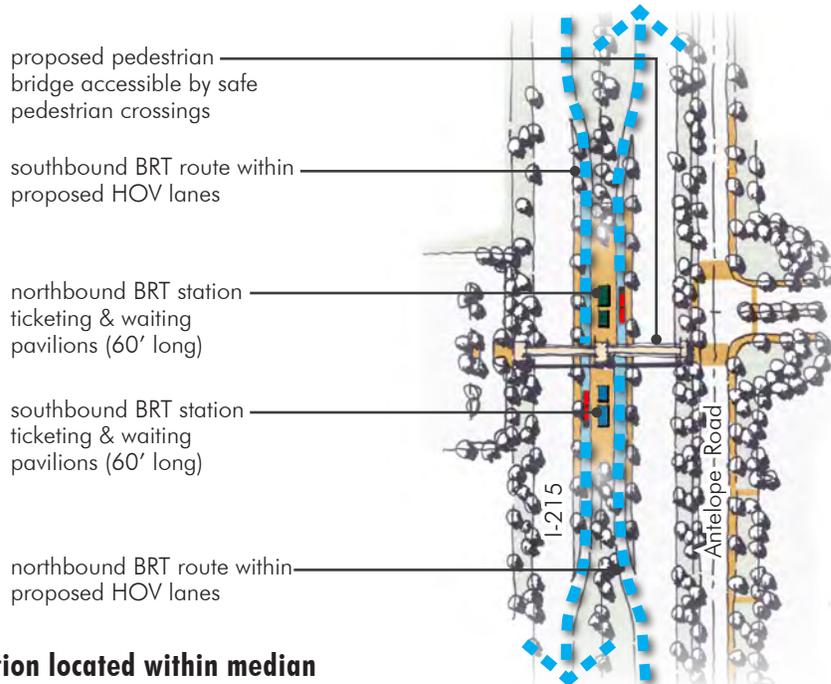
IN-LINE STATION CONCEPTUAL SITE PLANS
